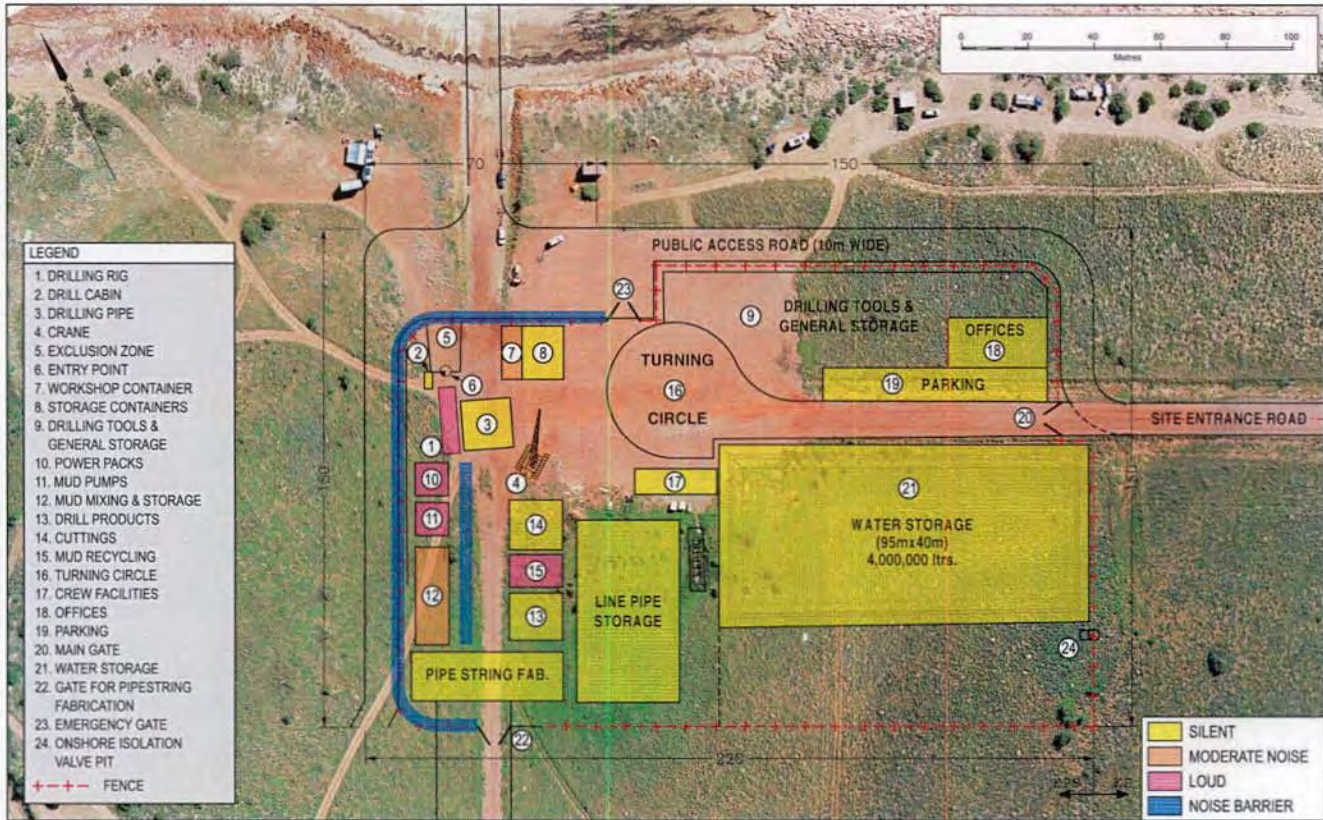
HDD Construction Site Noise Barrier – Option 3.
